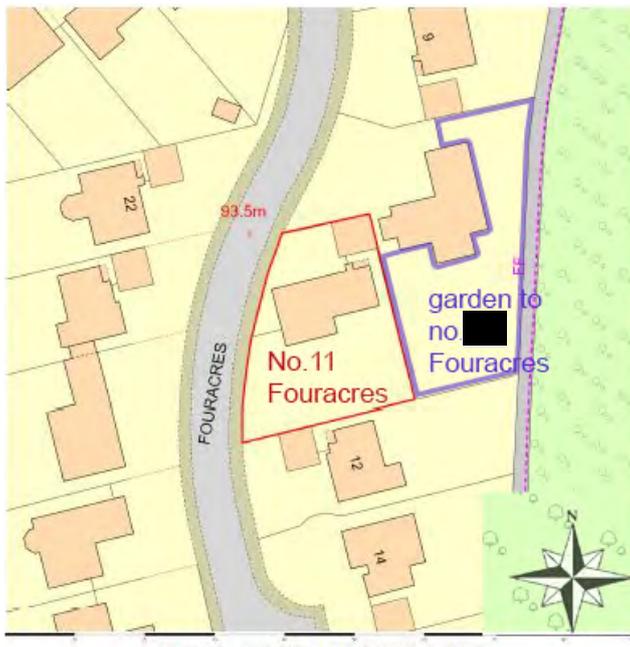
Location plan showing application site (no.11) marked in red outline, and garden to no. [REDACTED] marked in blue outline.
